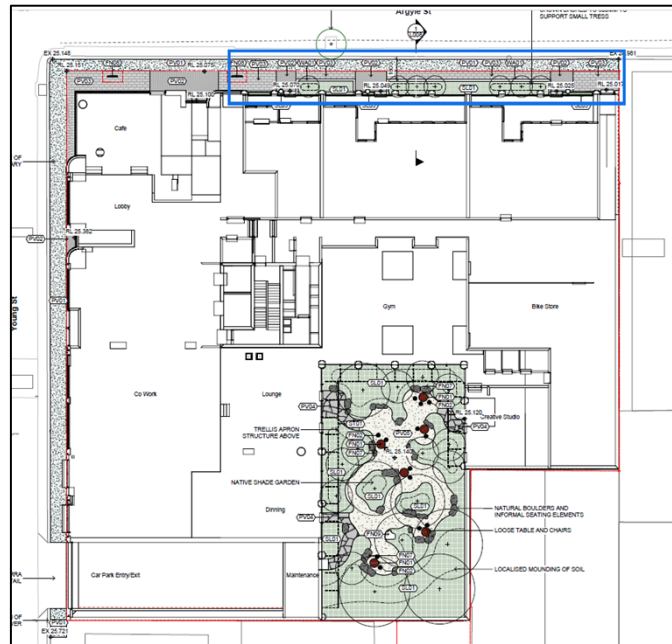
Landscape Plan dated 25.12.2025 showing raised planters within the widened Argyle Street footpath outlined in blue (Source: FK Architects, dated 10.03.2026)
